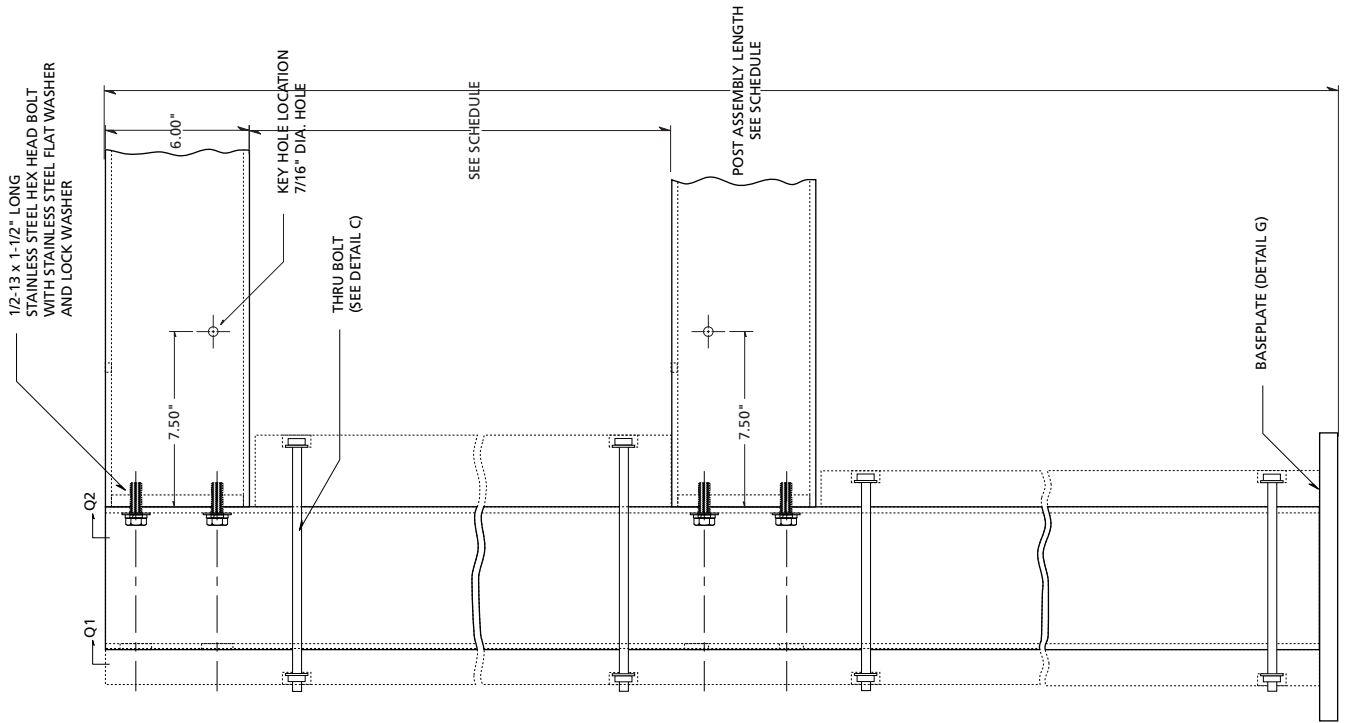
DETAIL POST ASSEMBLY 6 x 4 SIDE ELEVATION Q2
